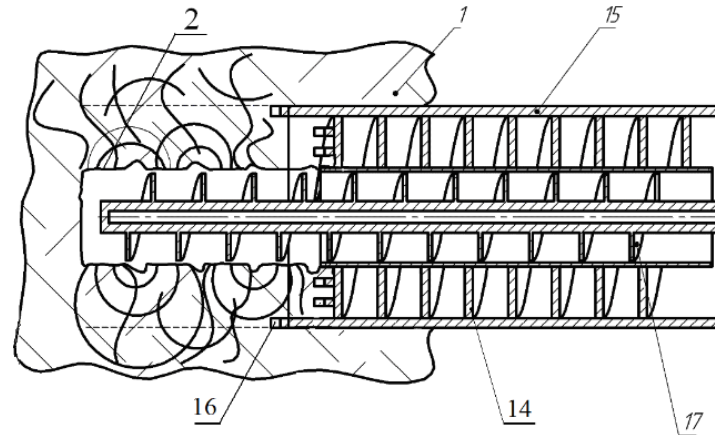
Longitudinal section of the device for expanding the well after explosive explosions with a mechanical drilling tool
